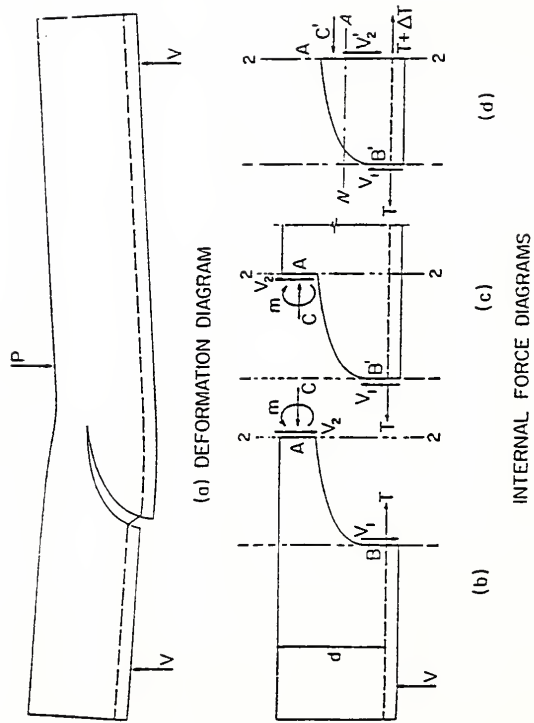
Inclined crack in Reinforced Concrete beams similar to that observed in Deck panel
